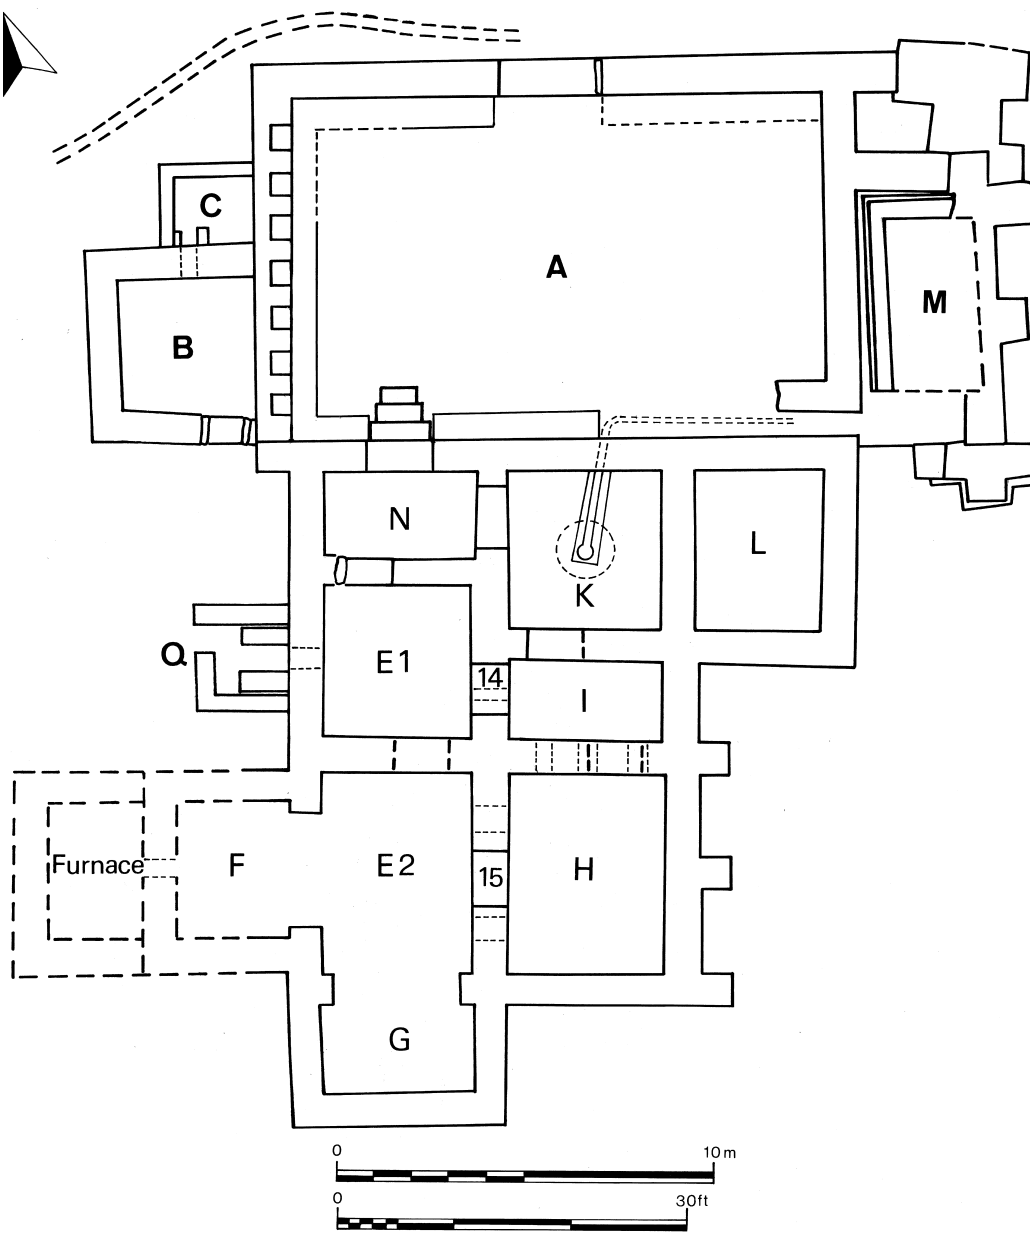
Plan of the baths in Periods 1b and 1c. Scale 1:200.
